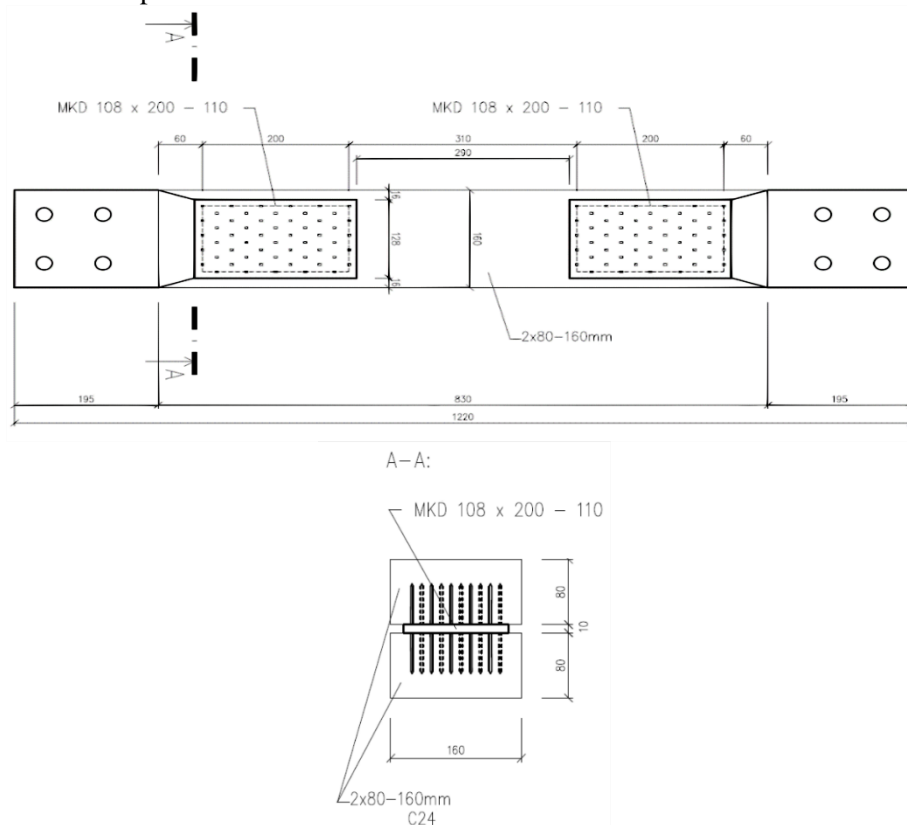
Diagram of the test specimen with an MKD nail plate (above) and the cross-section of the element (below).
